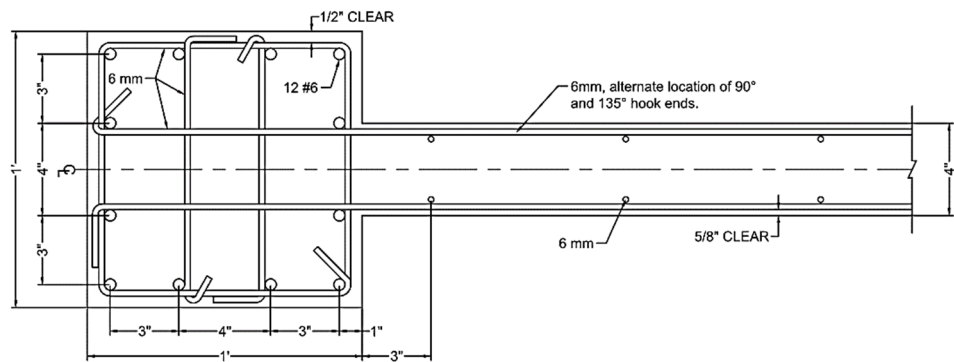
Shear Wall Specimen B5, B5R, B7 and B9 – Cross Section (Oesterle et al. 1976, 1979)
